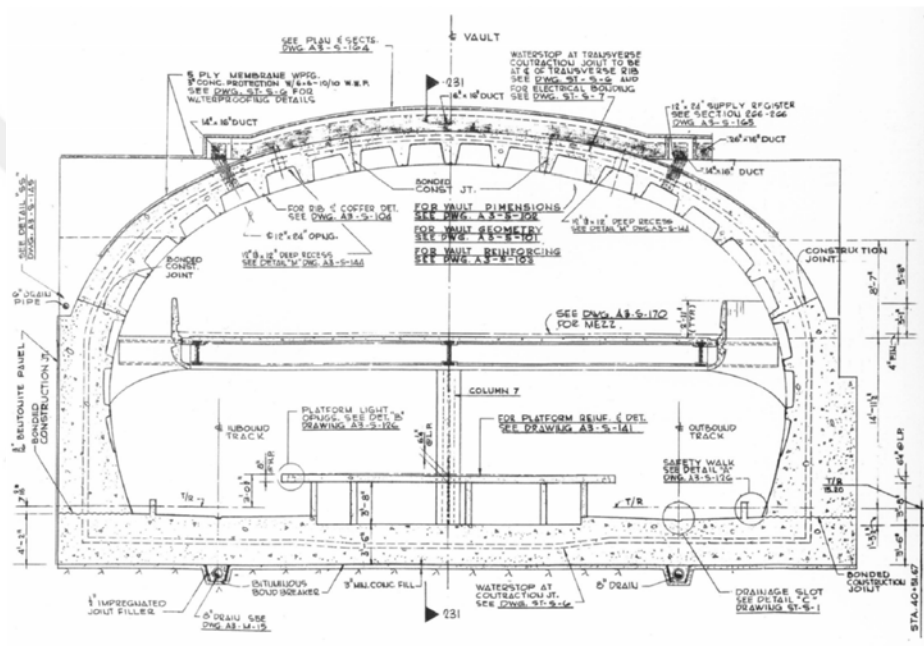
Section drawing of the vault for Washington subway with construction details (Miller and Raines, 2000)
